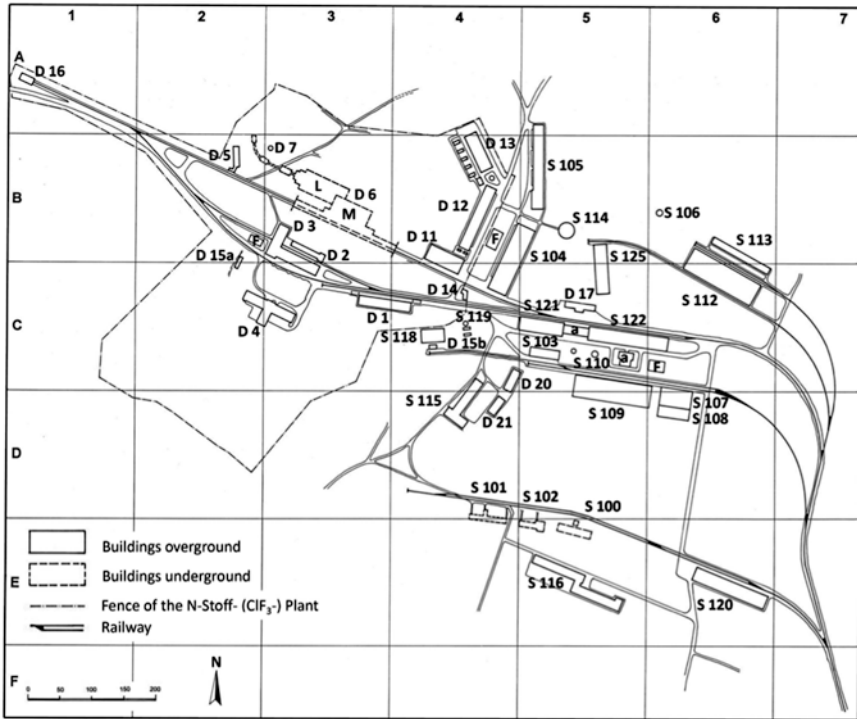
Layout of Monturon GmbH Falkenhagen (“Seewerk”) (Gesamtanlageplan - Seewerk S/o (M 1 : 2.500), Dipl. Ing. Max Haaf, Stuttgart, December 21, 1943, Preuss private collection)
